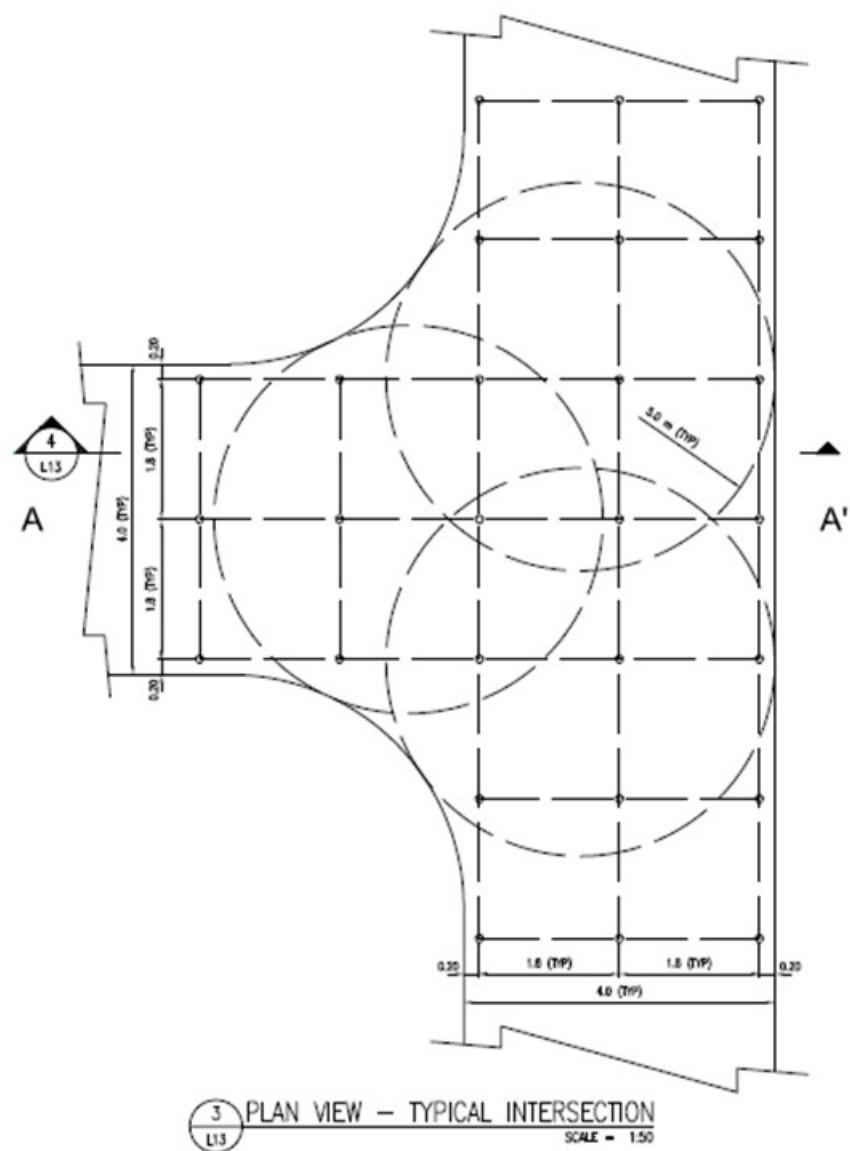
Plan of Cable Bolting Pattern in Intersections
